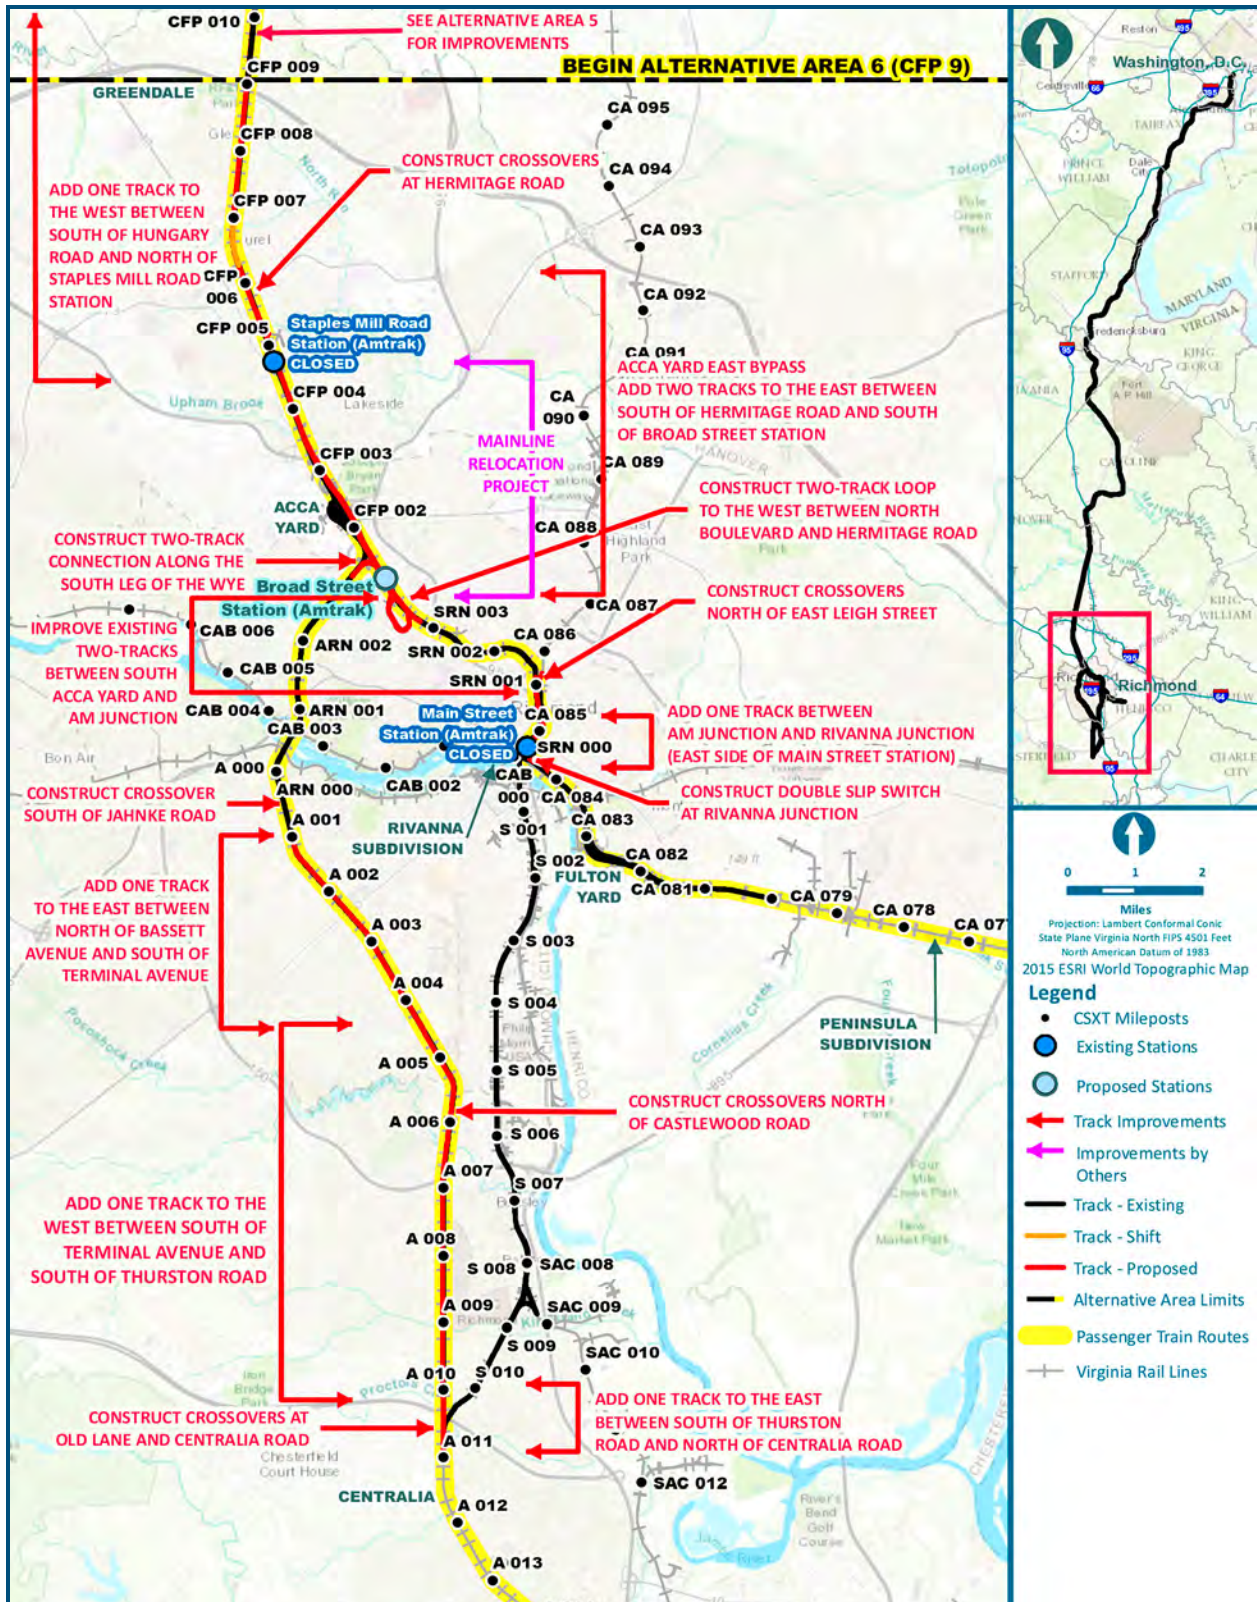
Build Alternative 6C – Broad Street Station Only
